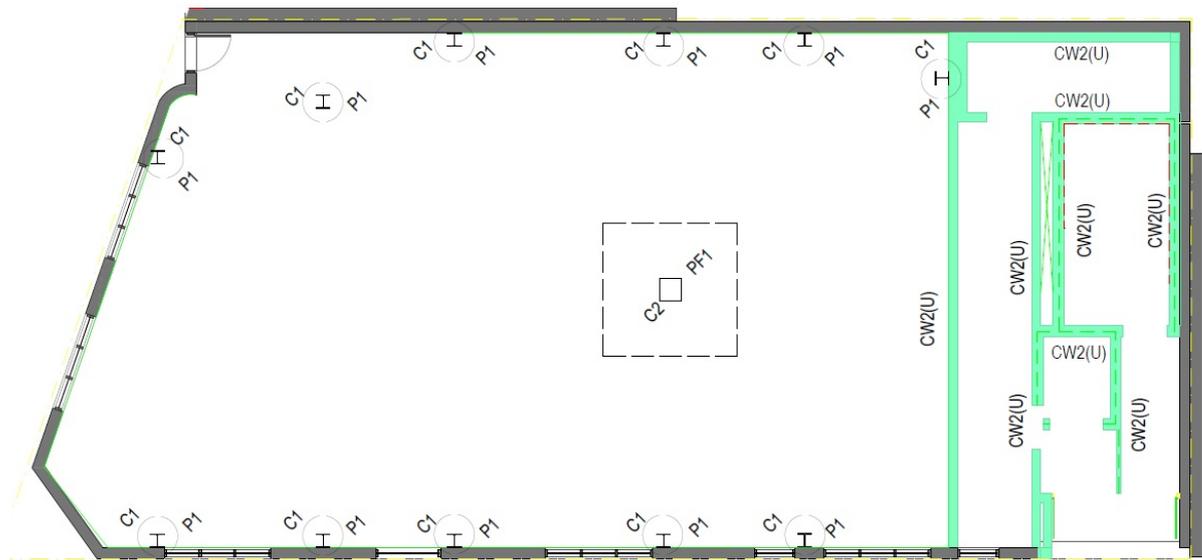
Feasibility ground slab and footing plan depicting steel perimeter beams and central concrete column and footing.
